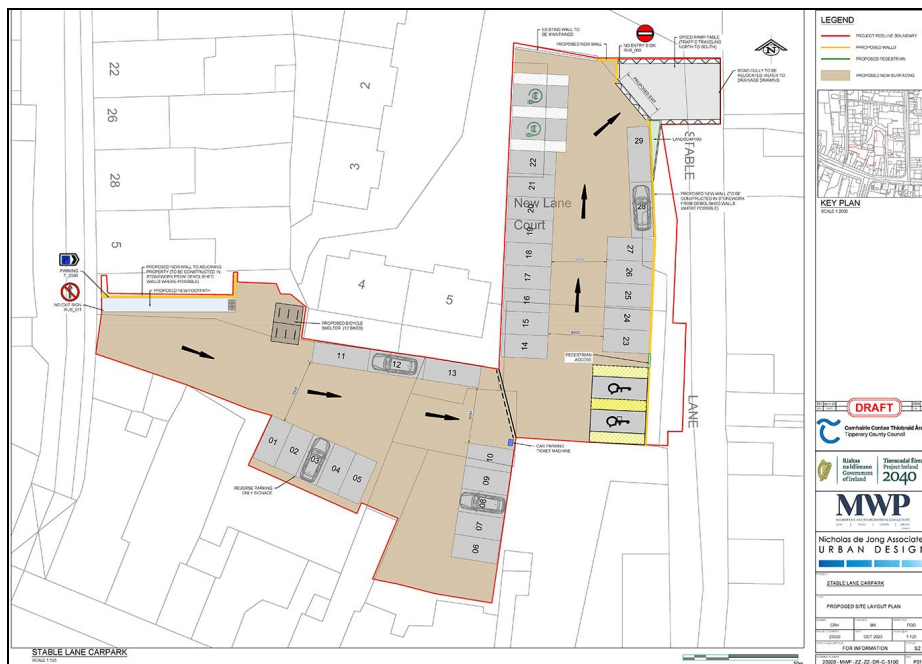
Proposed new car park site layout. Courtesy of MWP/NDJ.
